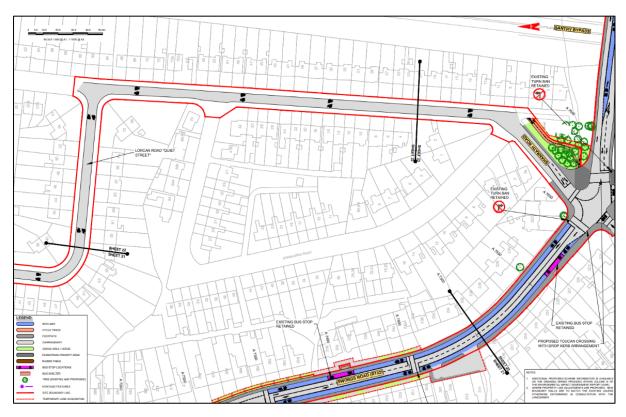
Extract from General Arrangement Drawing (Sheet 22)
